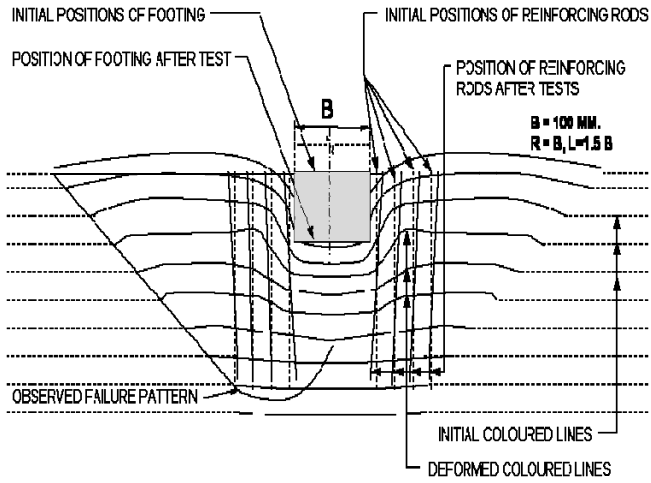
Failure Pattern of Reinforced Sand Subgrade
